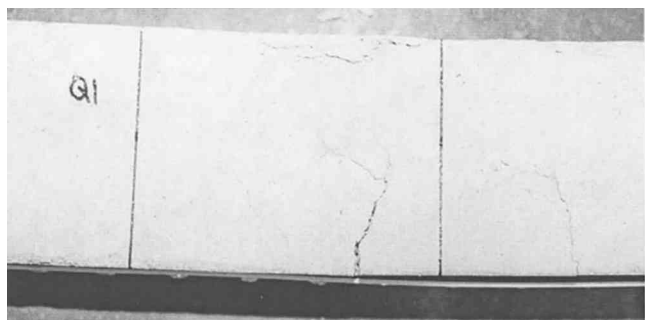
Composite strip remained attached after testing well past concrete crushing ($d \gg 76$ mm) in presence of flexural cracks in F-21-H-102-1.
